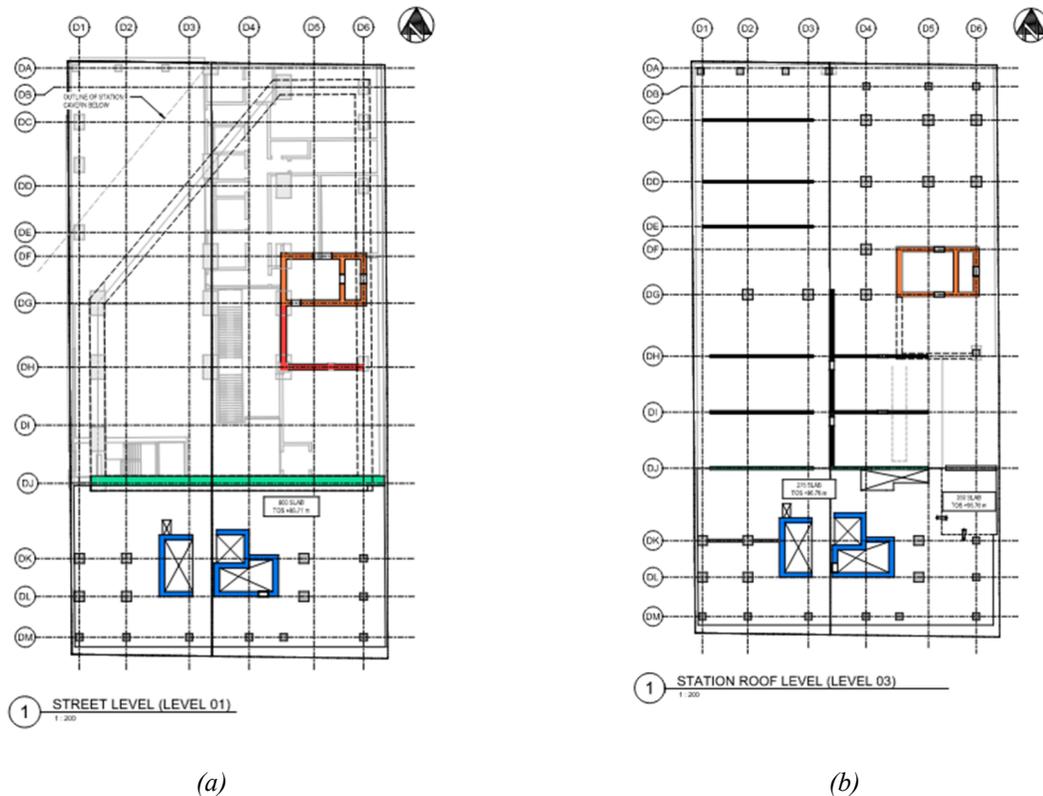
Structural wall layout: (a) Street Level, (b) Level 03 (Station Roof)
